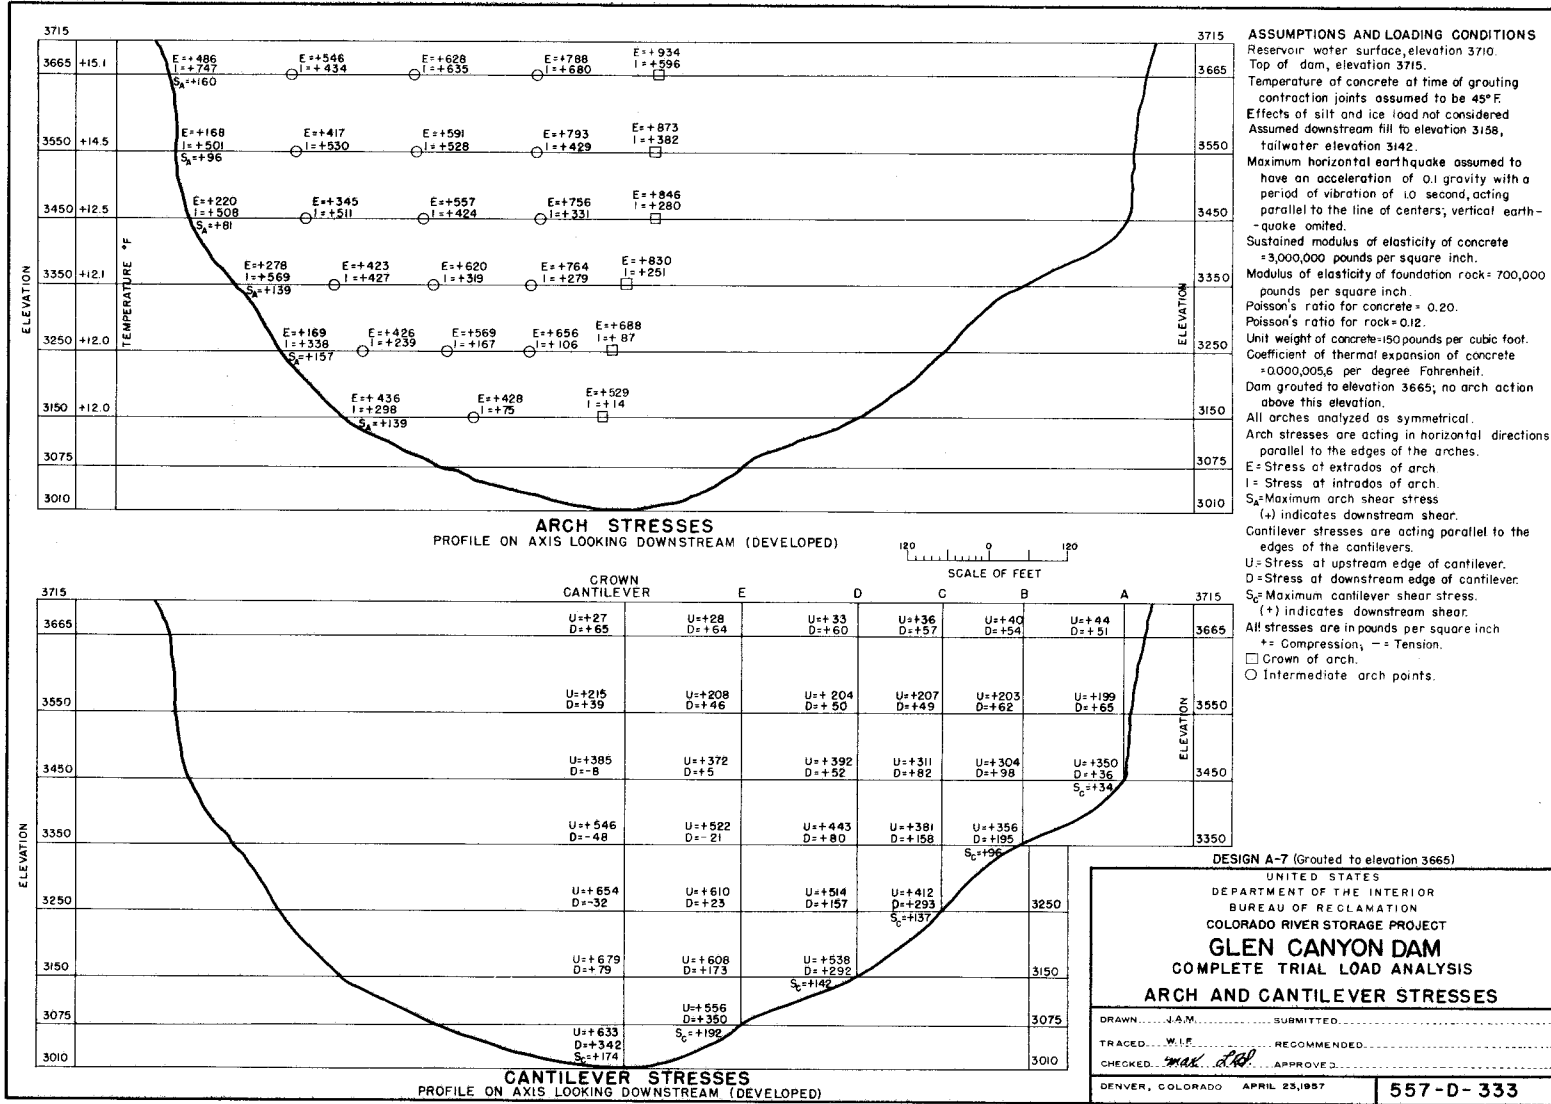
Dam design A-7 (grouted to elevation 3665), complete trial-load analysis—Arch and cantilever stresses.
